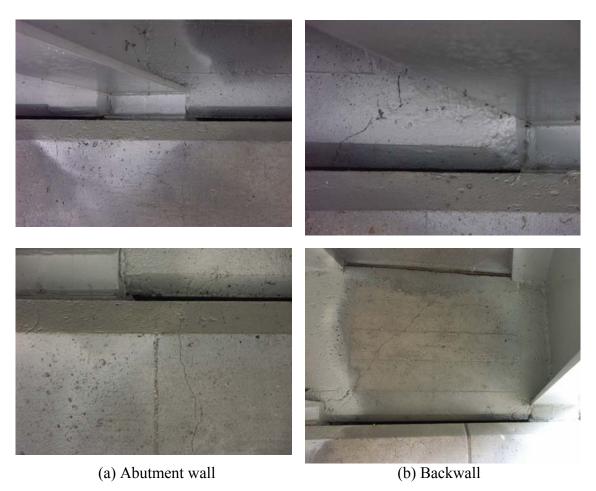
Cracking of (a) abutment wall and (b) backwall
